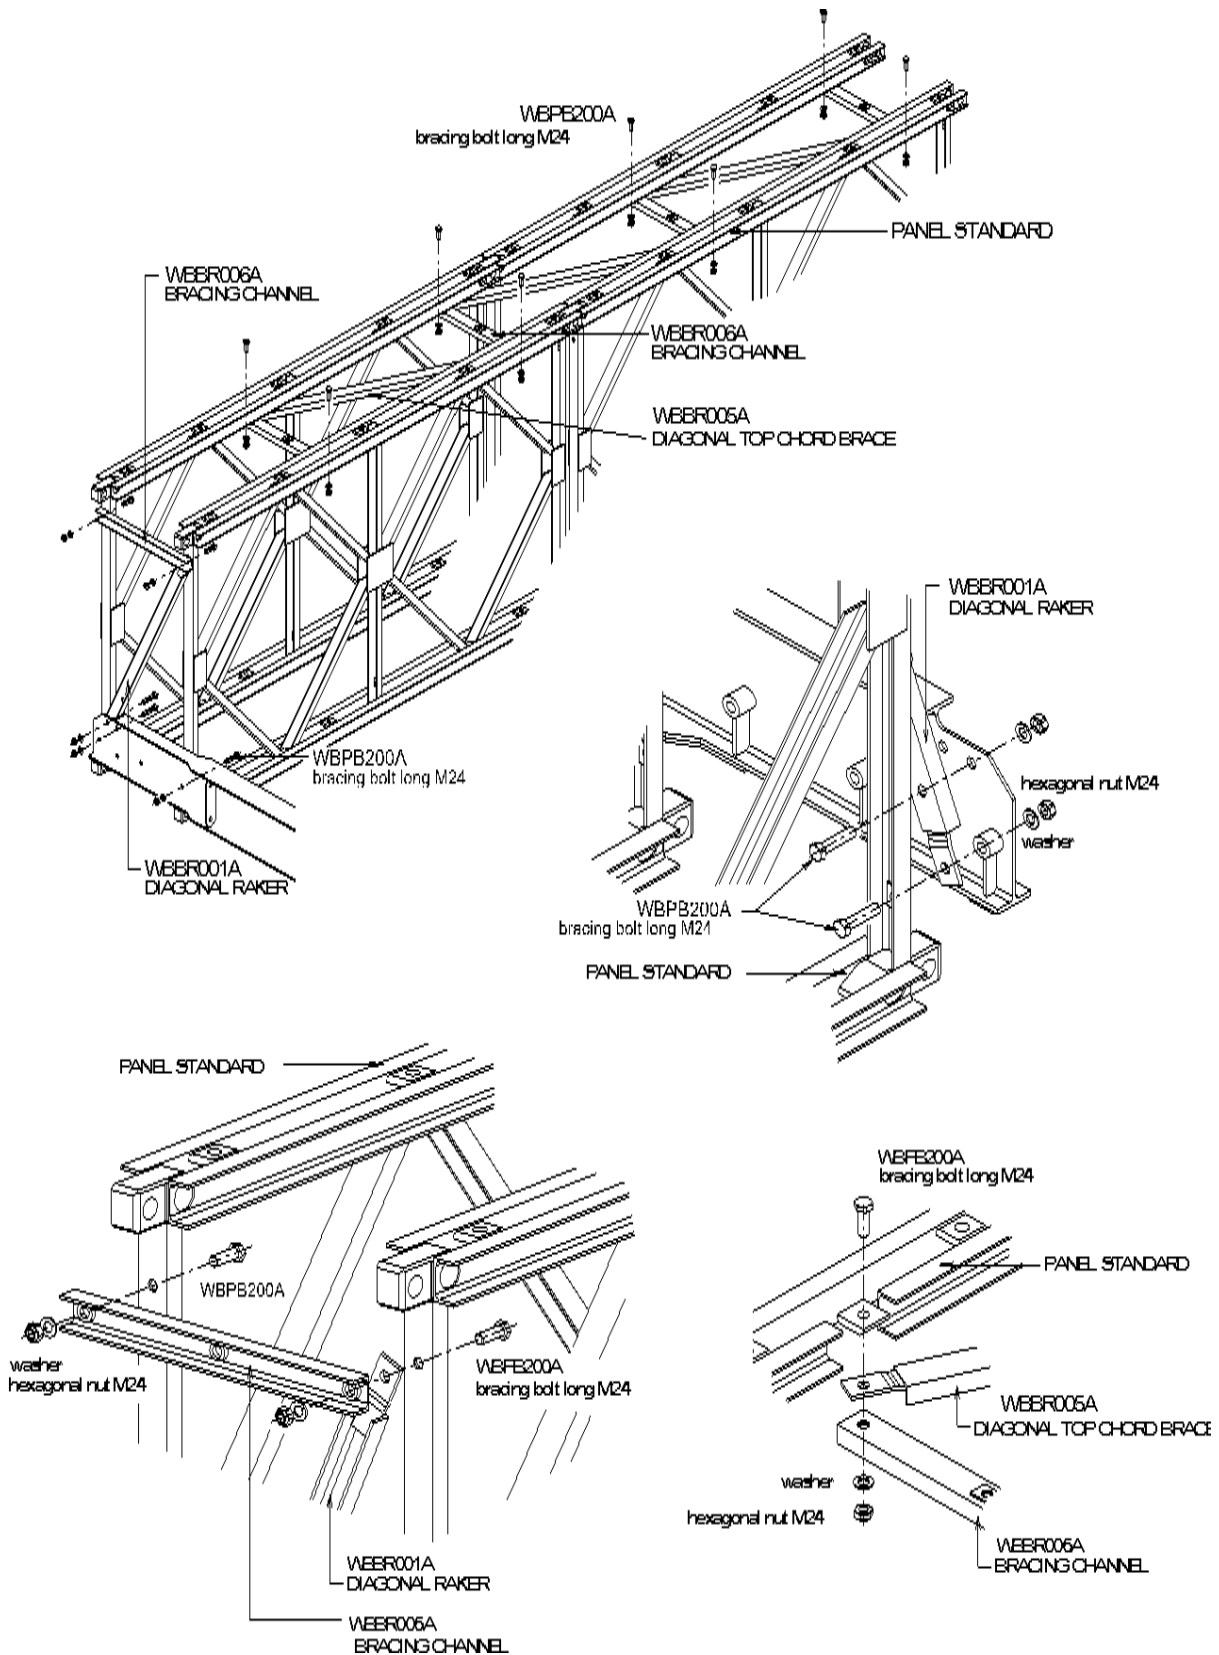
CONNECTION OF PANEL BRACINGS AND THE TRANSOM TO THE PANELS OF A DS-BRIDGE
